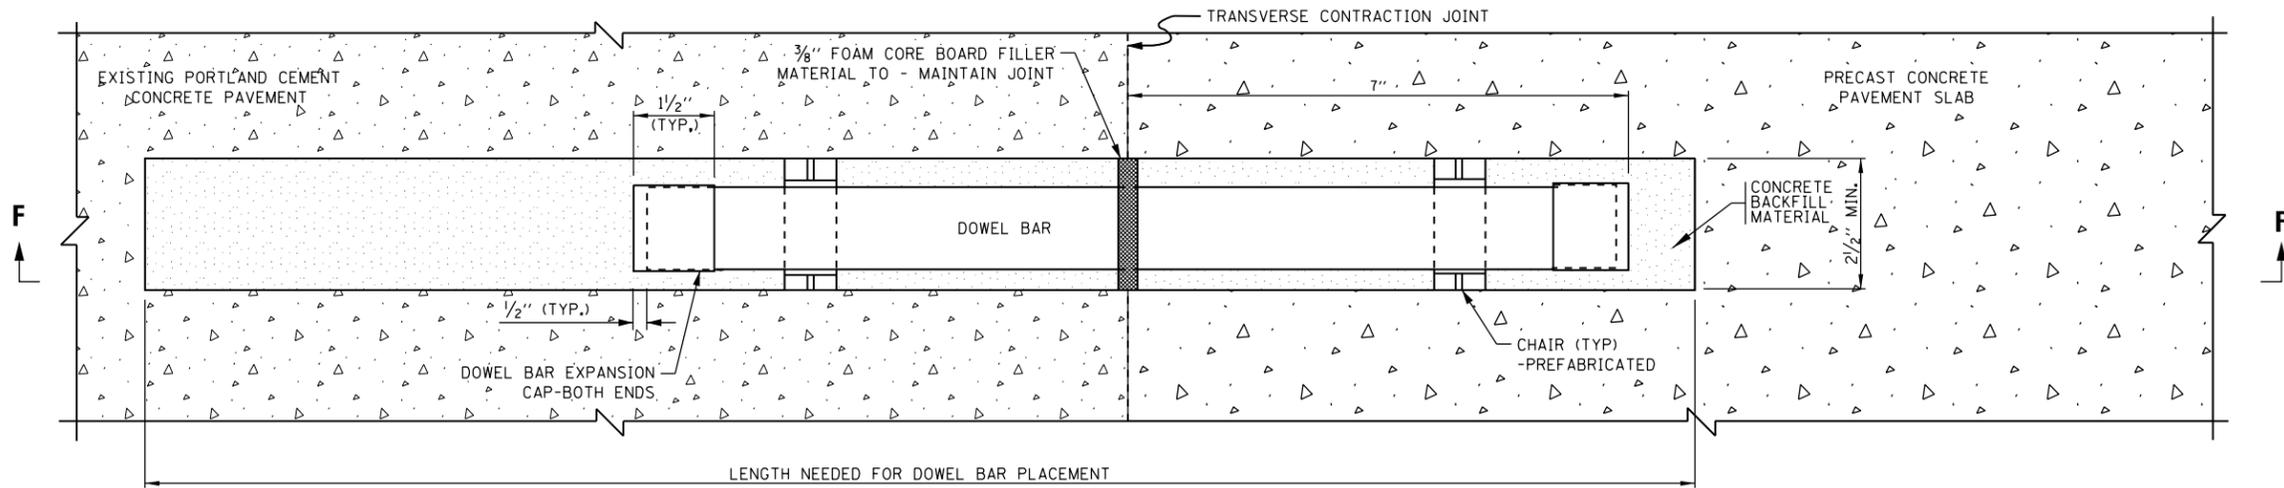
DETAIL E - WIDE MOUTH DOWEL BAR PLACEMENT DETAIL FOR CONSECUTIVE STANDARD PRECAST PANELS
